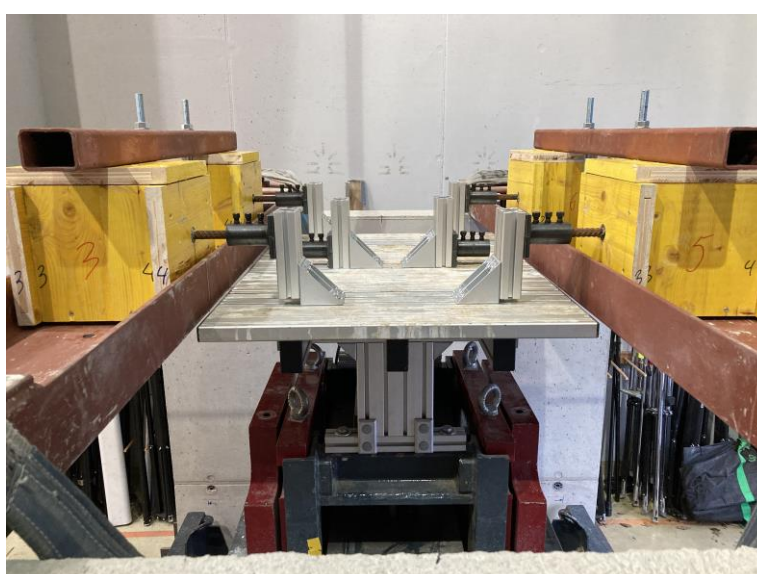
Fixed specimens of concrete with rebar which is subjected to vibrations (Series 2)
